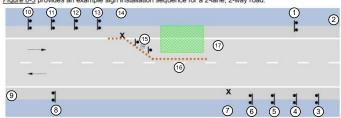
Example sign installation sequence for a 2-Jane 2-way road
